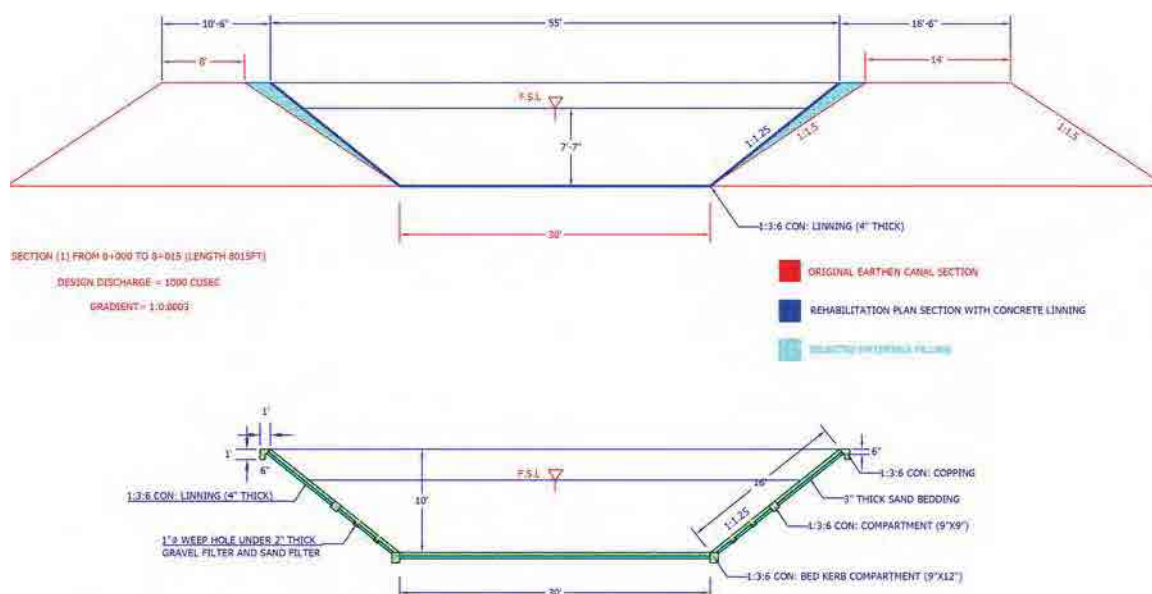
Proposed Main Canal Slope with Concrete Lining for Wegyi Irrigation System
